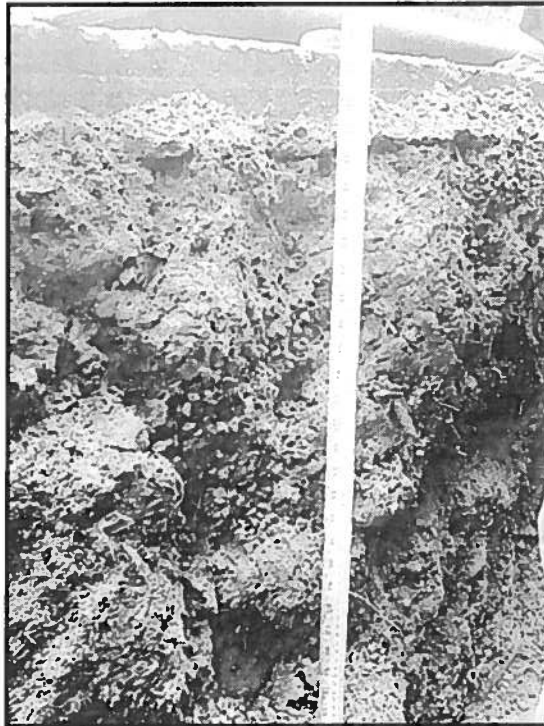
Many roads within the Village were constructed on organic fill. This photo shows a section of road underlain by 1200 mm of organic material.
